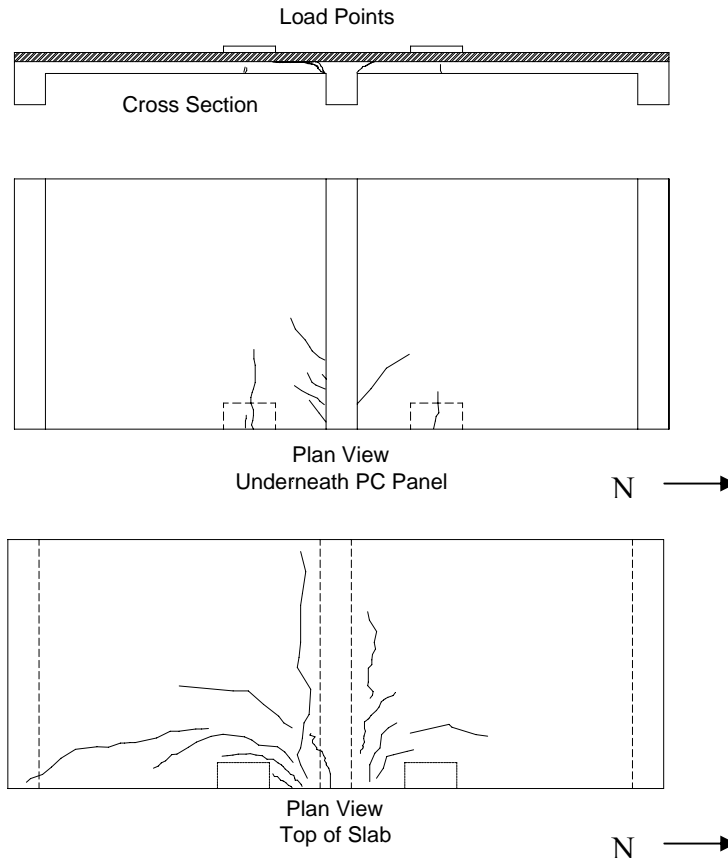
Crack Maps for Specimen N0P2 Test to Failure
